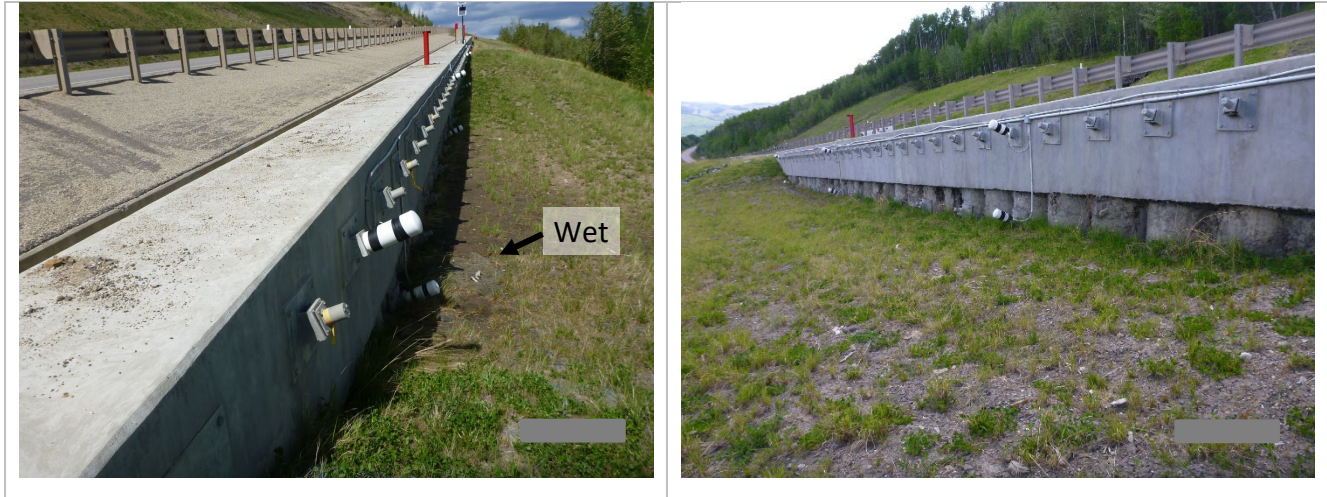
Pavement surface of Hwy 40:36. Photos taken June 2, 2025, facing southwest and northwest, respectively.
